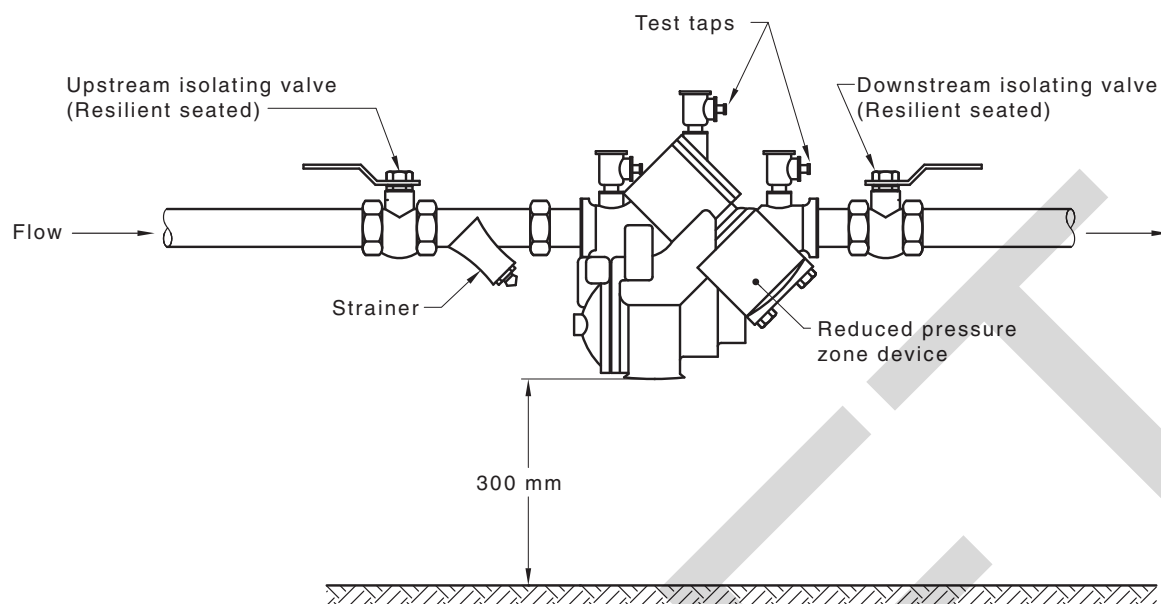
TYPICAL INSTALLATION OF A REDUCED PRESSURE ZONE DEVICE
